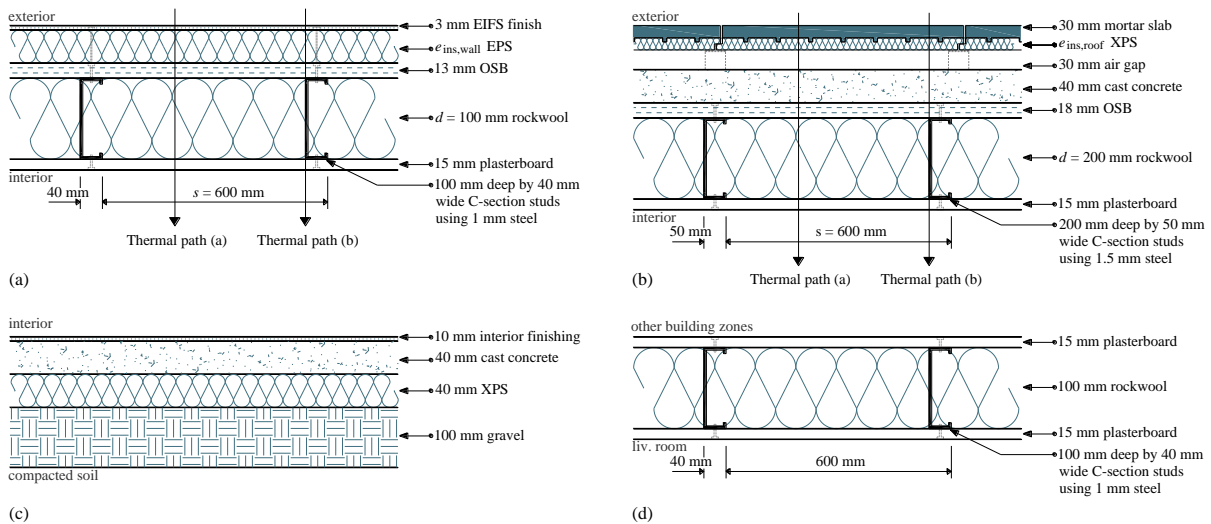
Cross-section of the construction elements considered in the model: (a) exterior wall, (b) roof, (c) slab-on-grade and (d) partition wall.
